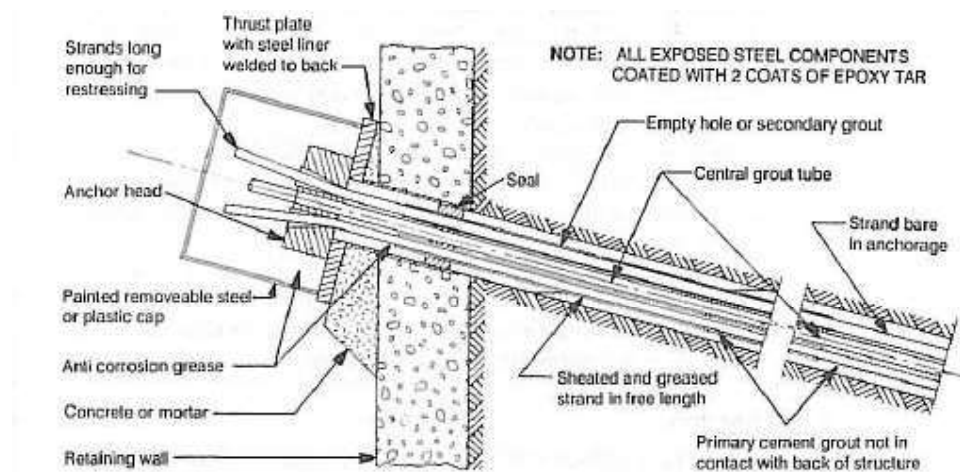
Typical detail for restressable permanent strand anchors (SAICE code of practice, ref 8)
